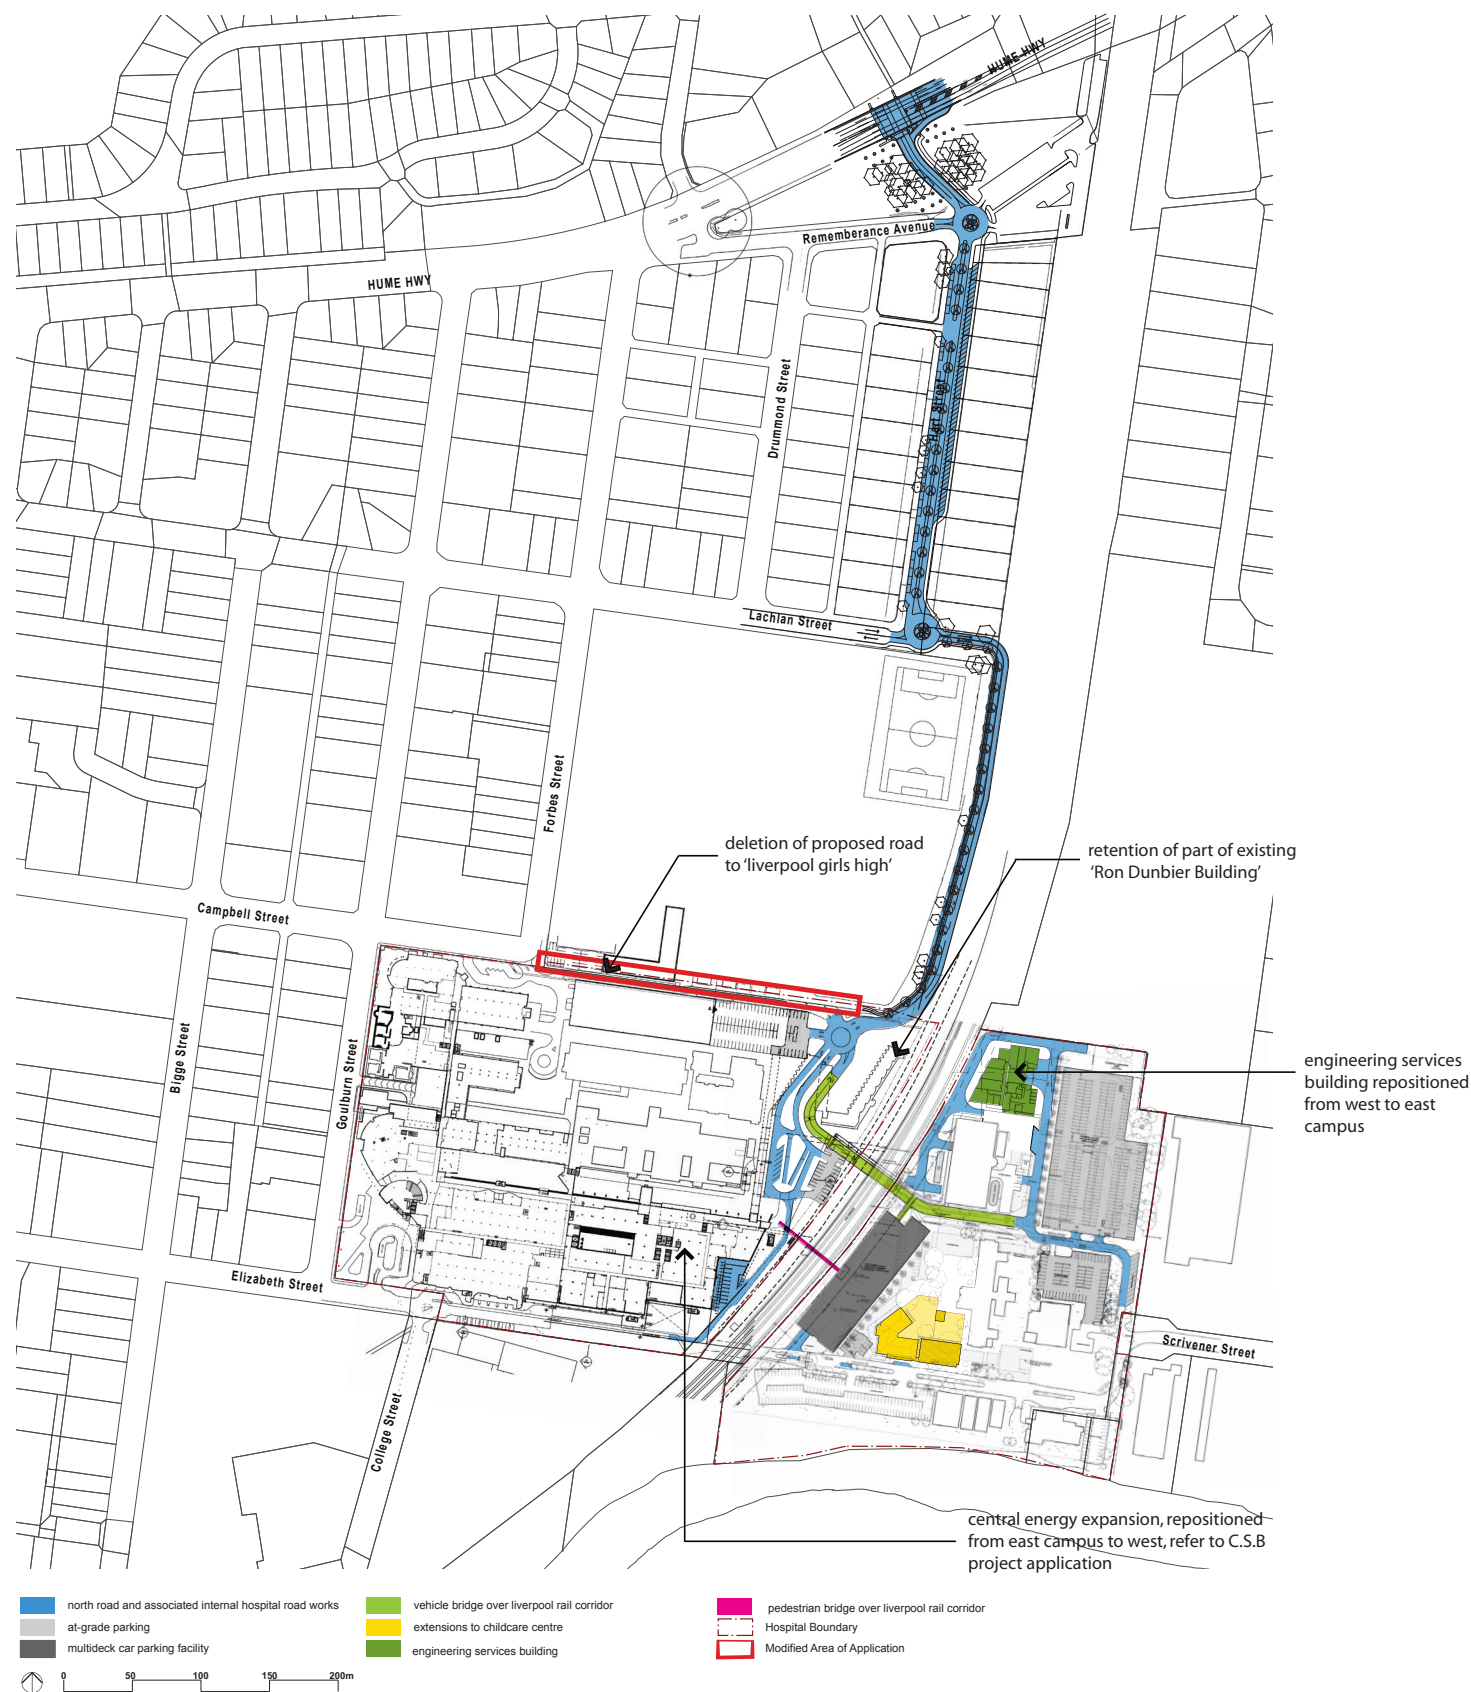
Infrastructure and Ancillary Works - Changes to Concept Plan
